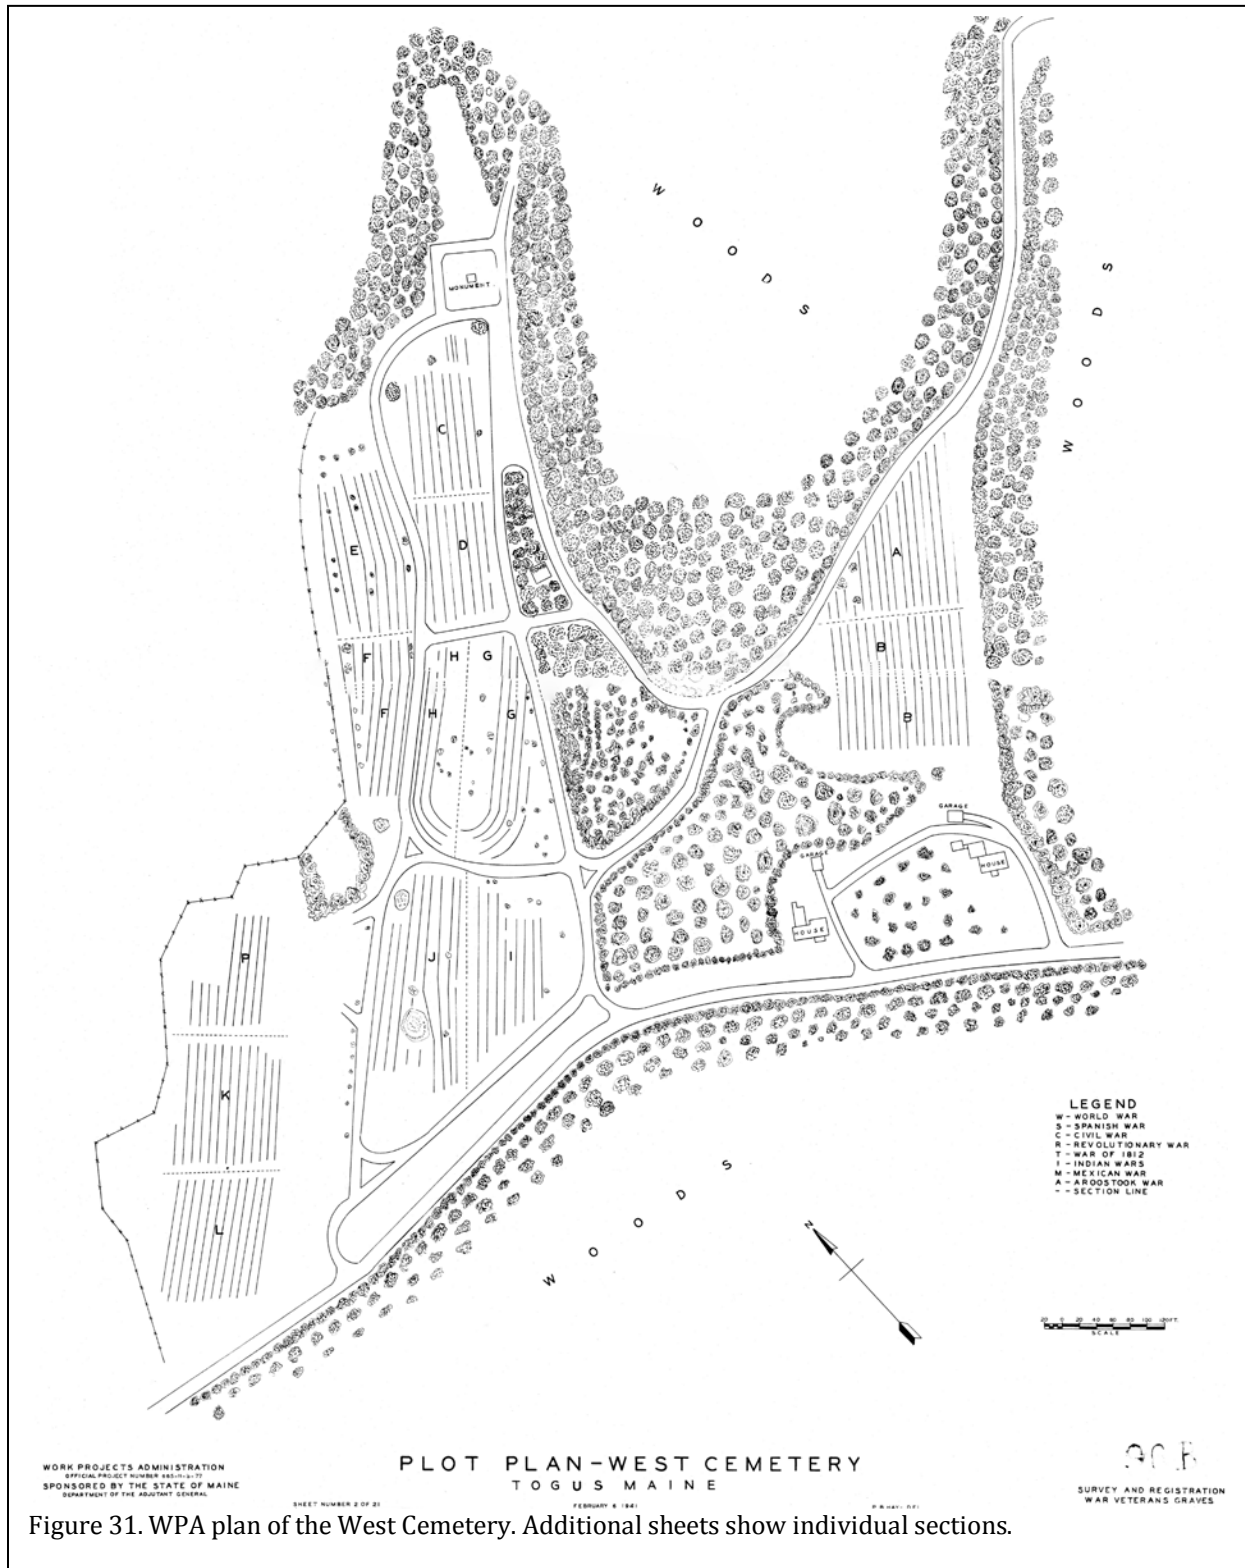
WPA plan of the West Cemetery. Additional sheets show individual sections.
